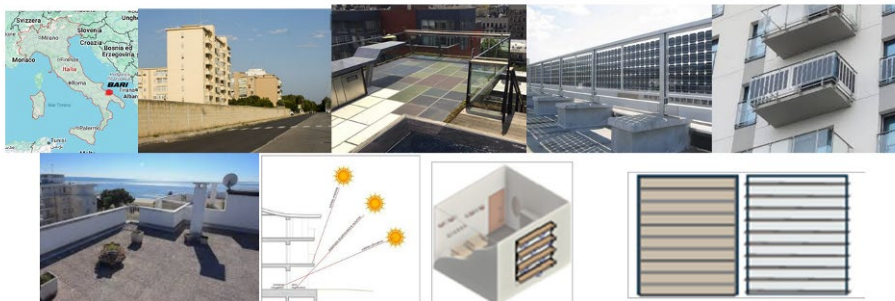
Adopted building design's choices: location, urban environment, PV walkable floor, Parapet's photovoltaic panels, cantilever balcony, plane terrace, South orientation, horizontal louvers, window shading systems
